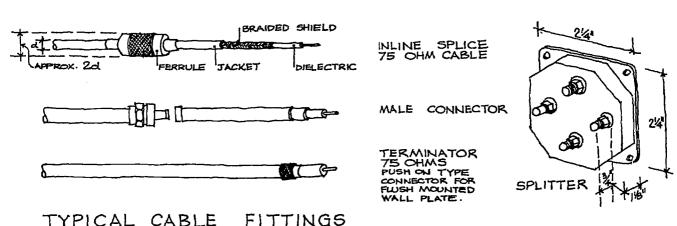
TYPICAL CABLES AND CABLE FITTINGS
